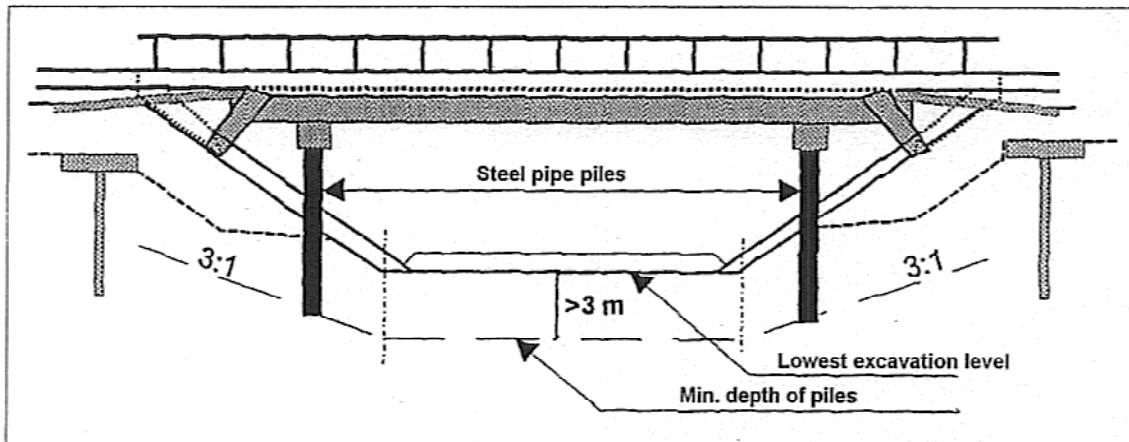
Typical cross-section of Finnish railway bridge [13]. In certain conditions the desired (minimum) depth of pile is not reached with driven piles and the use of drilled pile will be reasonable.
